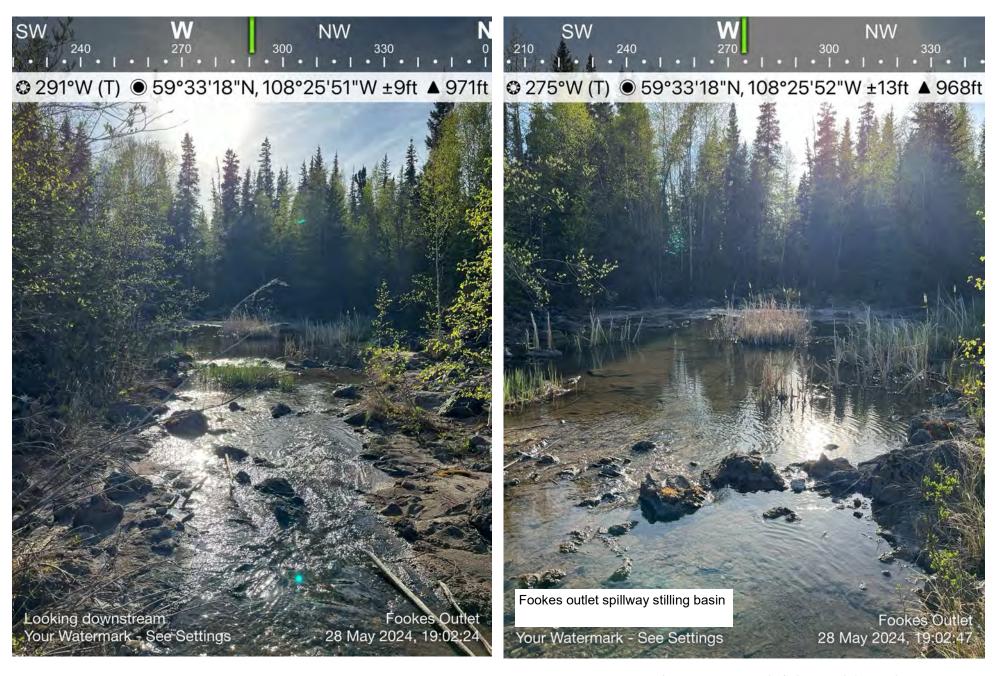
Fookes Reservoir Spillway looking downstream (mid channel)
